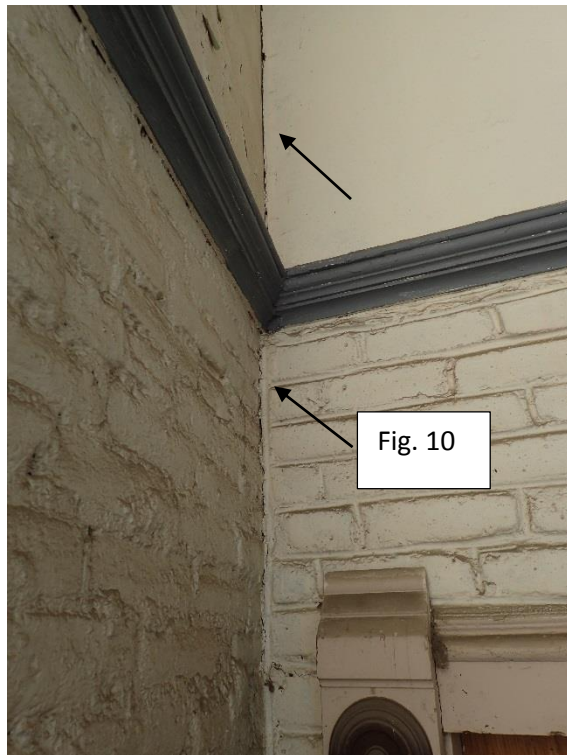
Vertical cracking between façade and perpendicular wall
